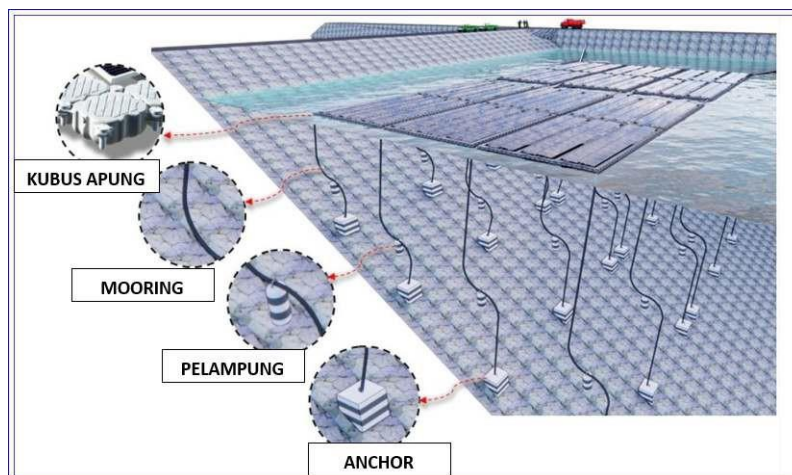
Modeling of the Foundation Structure of the Floating Solar Panel Dam
